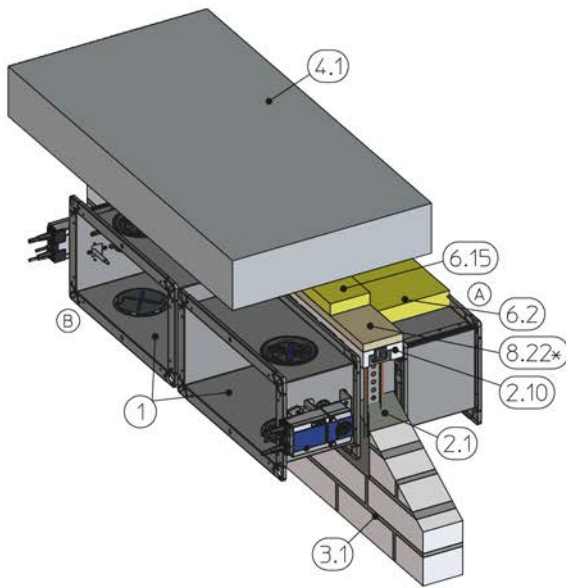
Mortar-based installation into a solid wall with flexible ceiling joint, with installation kit GM
